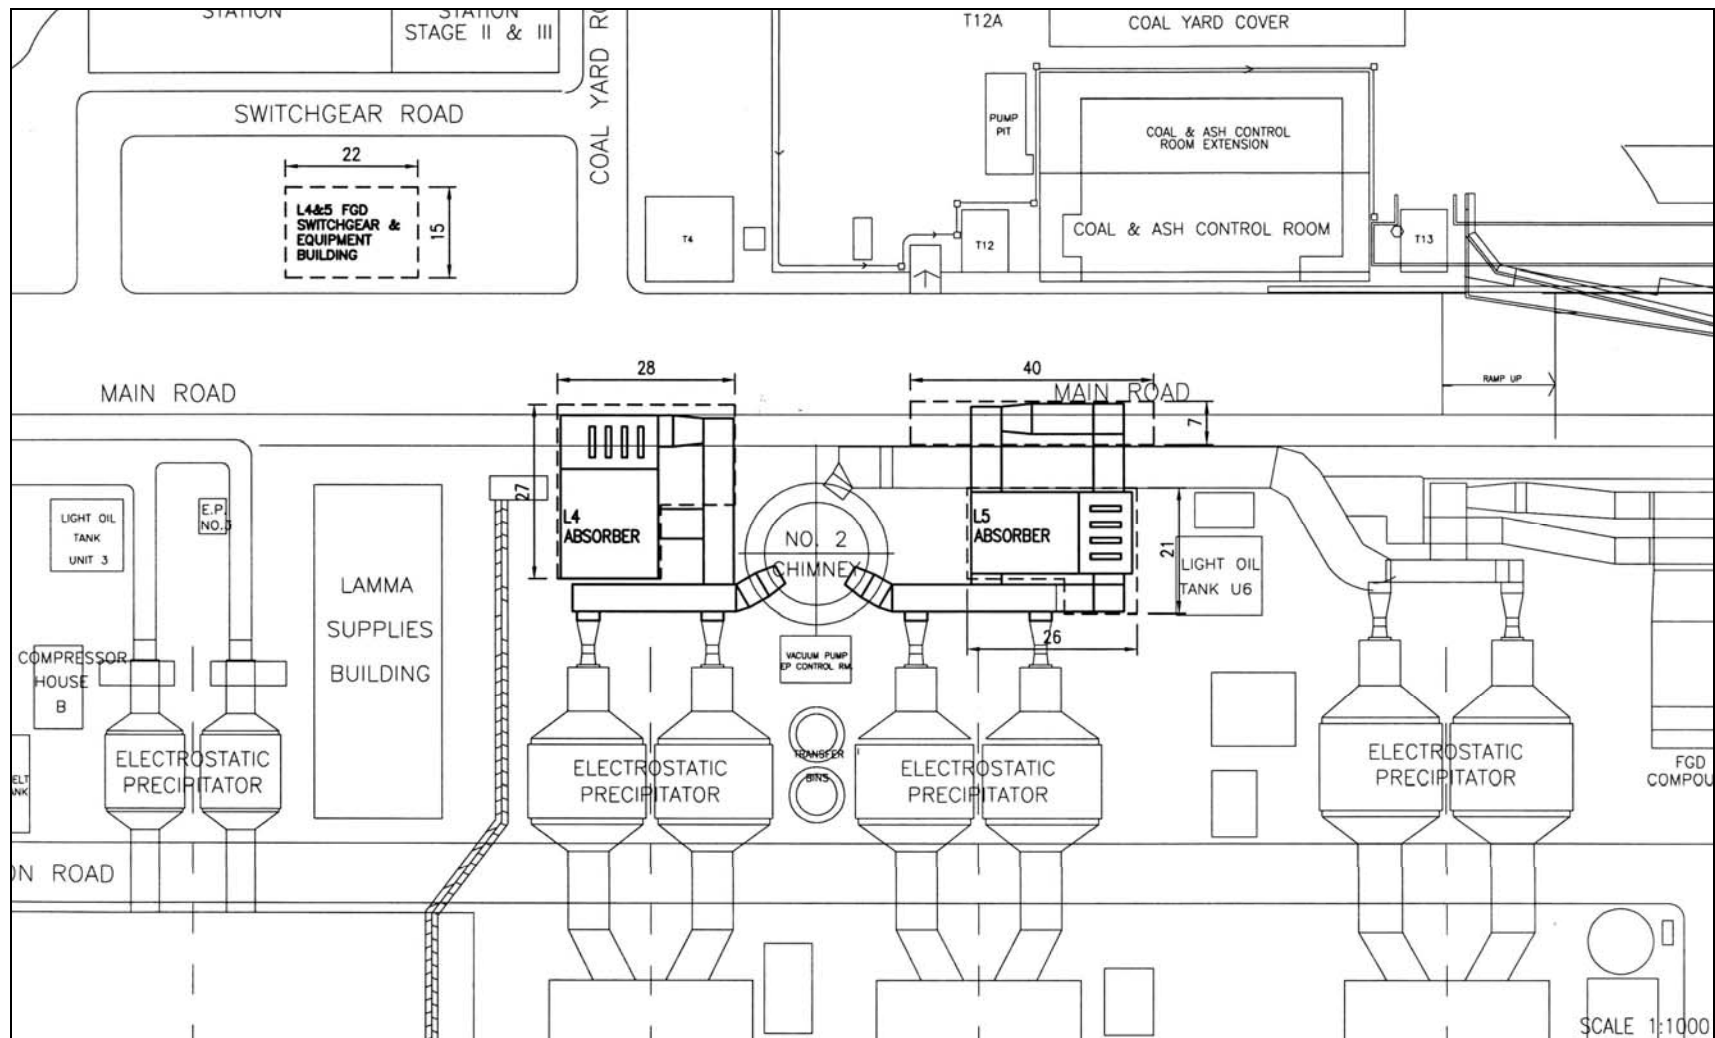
General Arrangement of L4 & L5 FGD Plant
